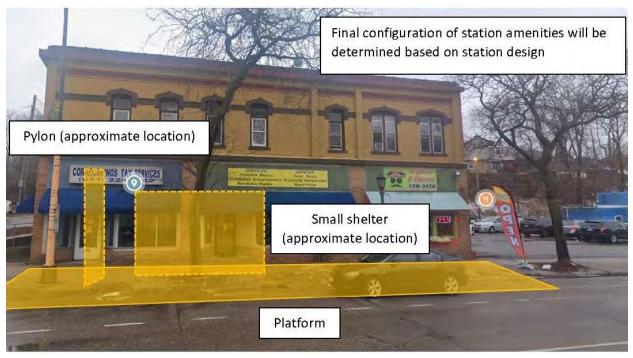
Cesar Chavez Street and State Street South proposed southbound platform.
